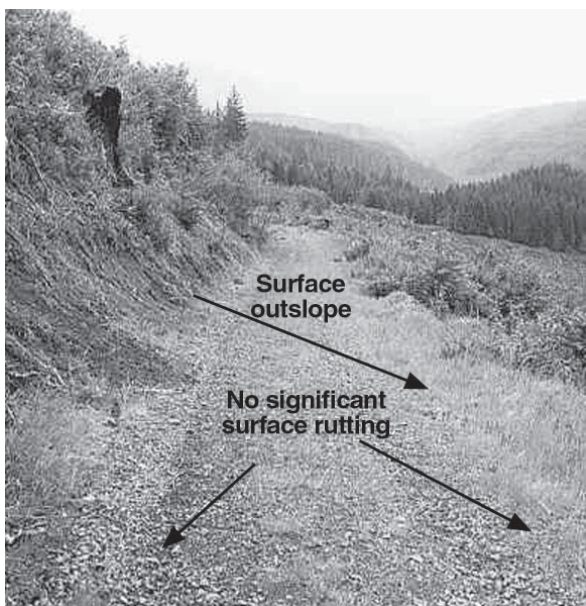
Minor cut bank sloughing on an outsloped road after a serious storm.
